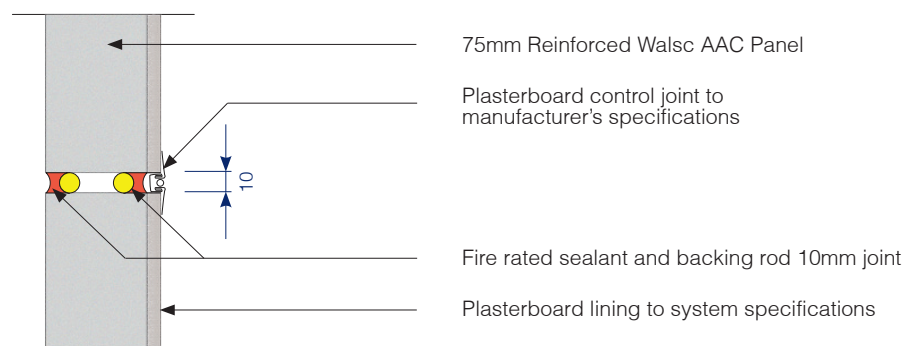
Service Shaft Wall Option 1 Vertical Control Joint Detail
